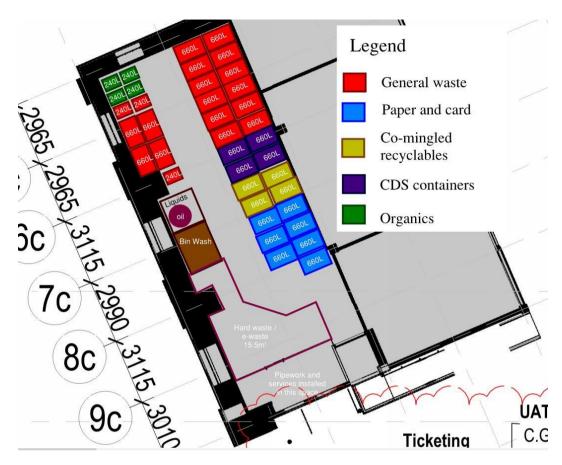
Indicative central waste room layout. Shown on drawing STC_A_1100
